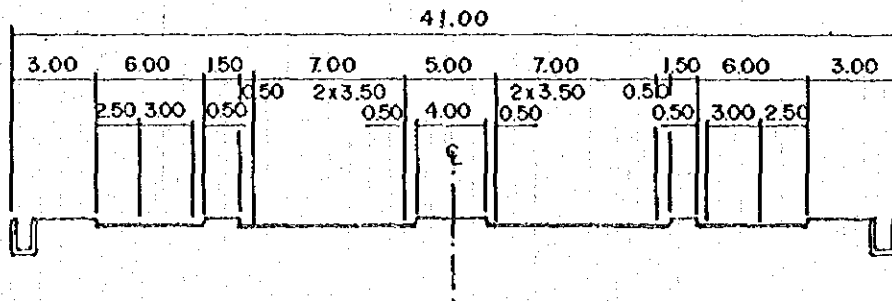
Typical Cross Section of Primary Arterial Road & Secondary Major Arterial Road (Type II/Class I)
